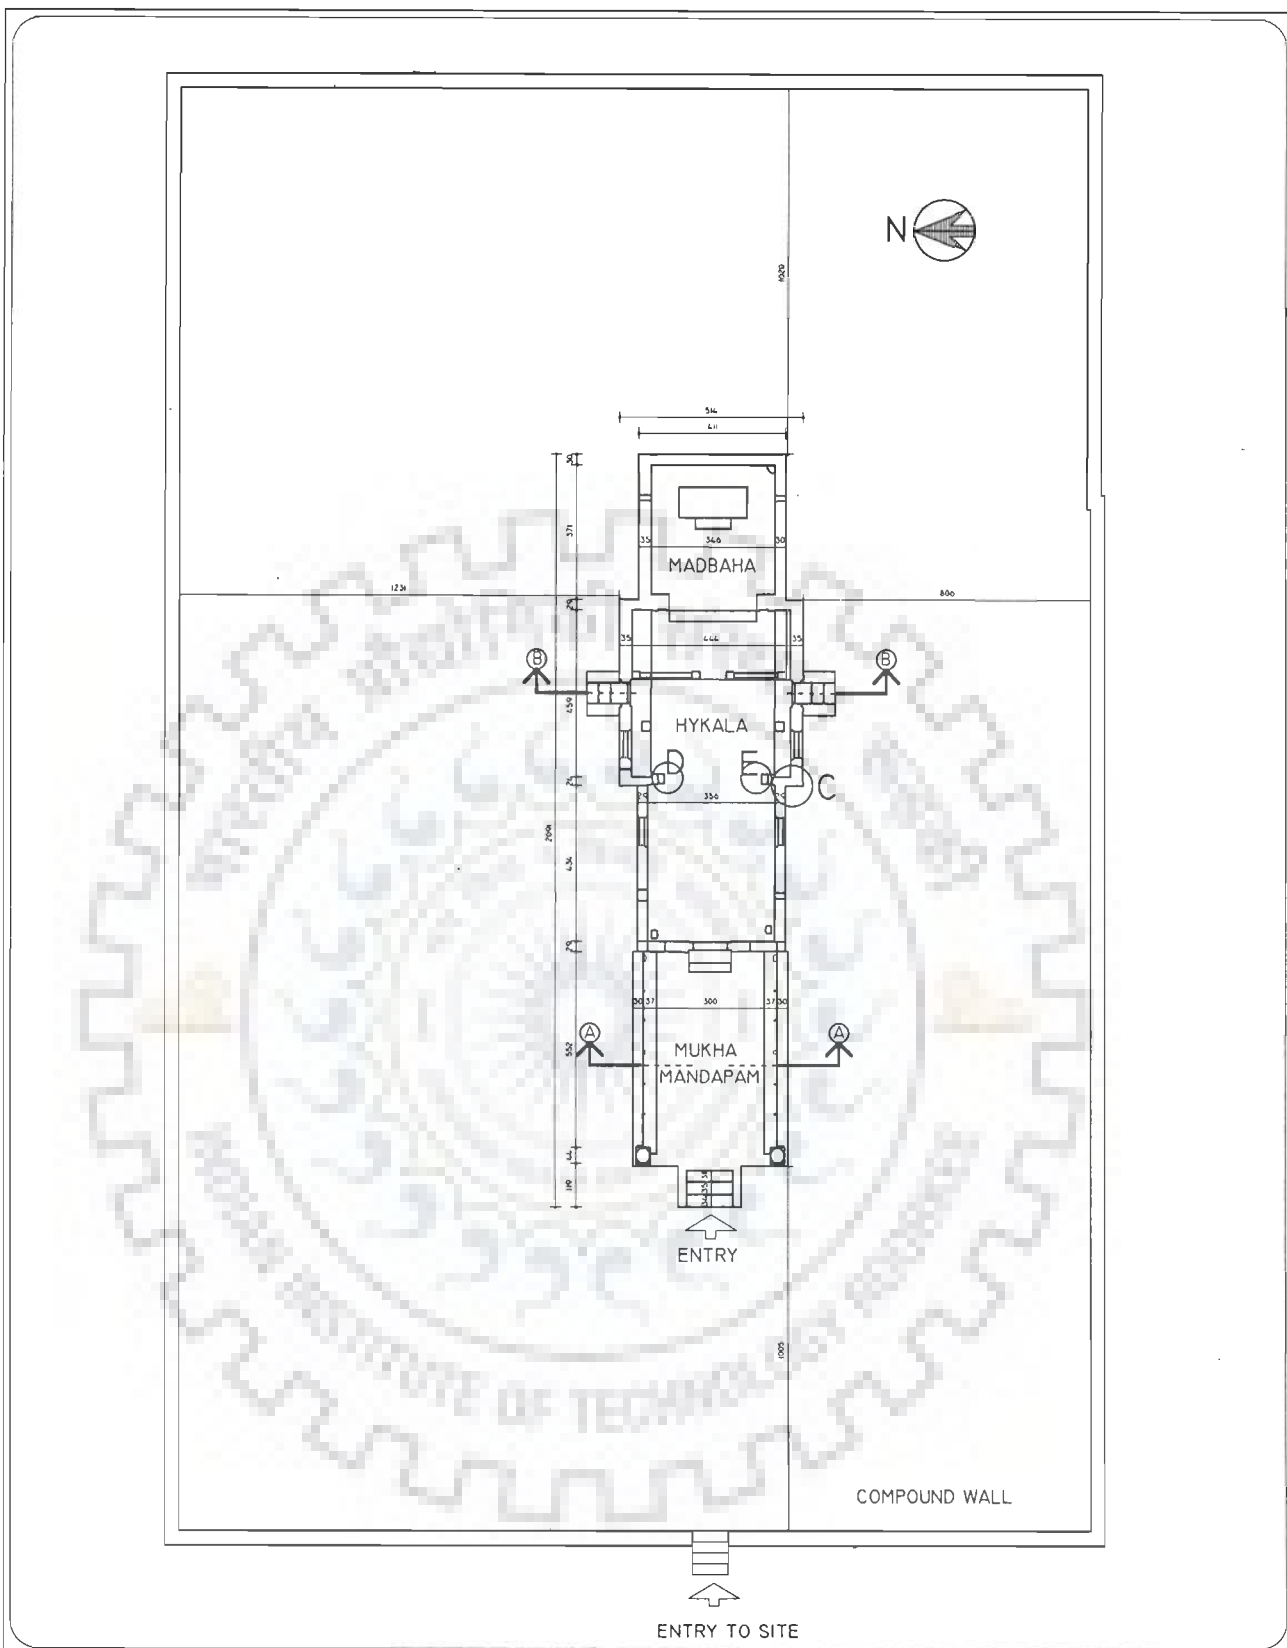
PLAN (WITH SITE PLAN) THIRUVITHANCODE CHURCH
